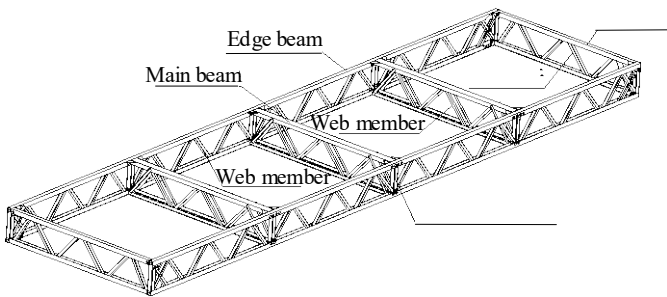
Isometric layout of the truss beams using for the modular plate components.
